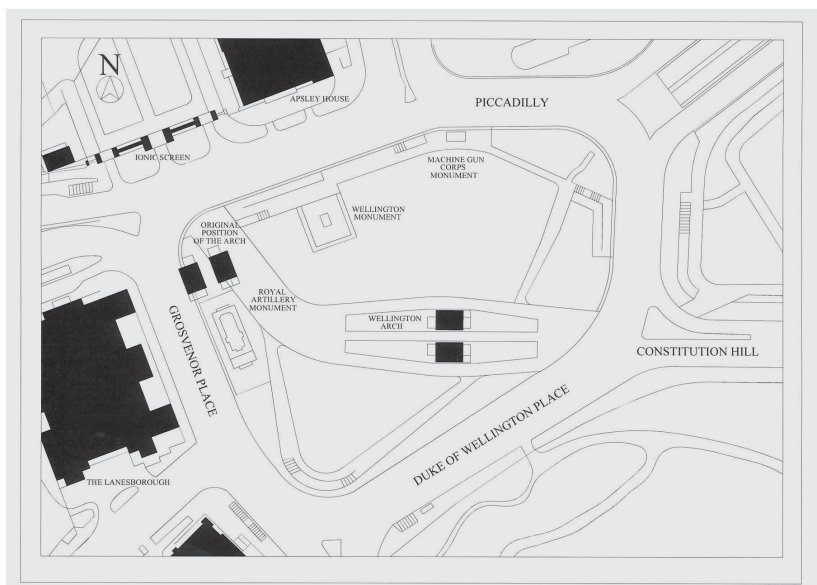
Plan of the Wellington Arch in its current and original positions. Drawing © P. Avis
